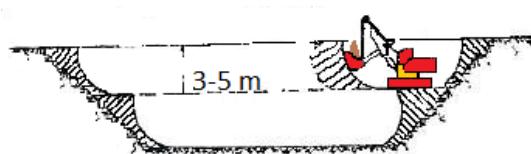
The depth of the dredge excavation and layout of slopes in the excavation
